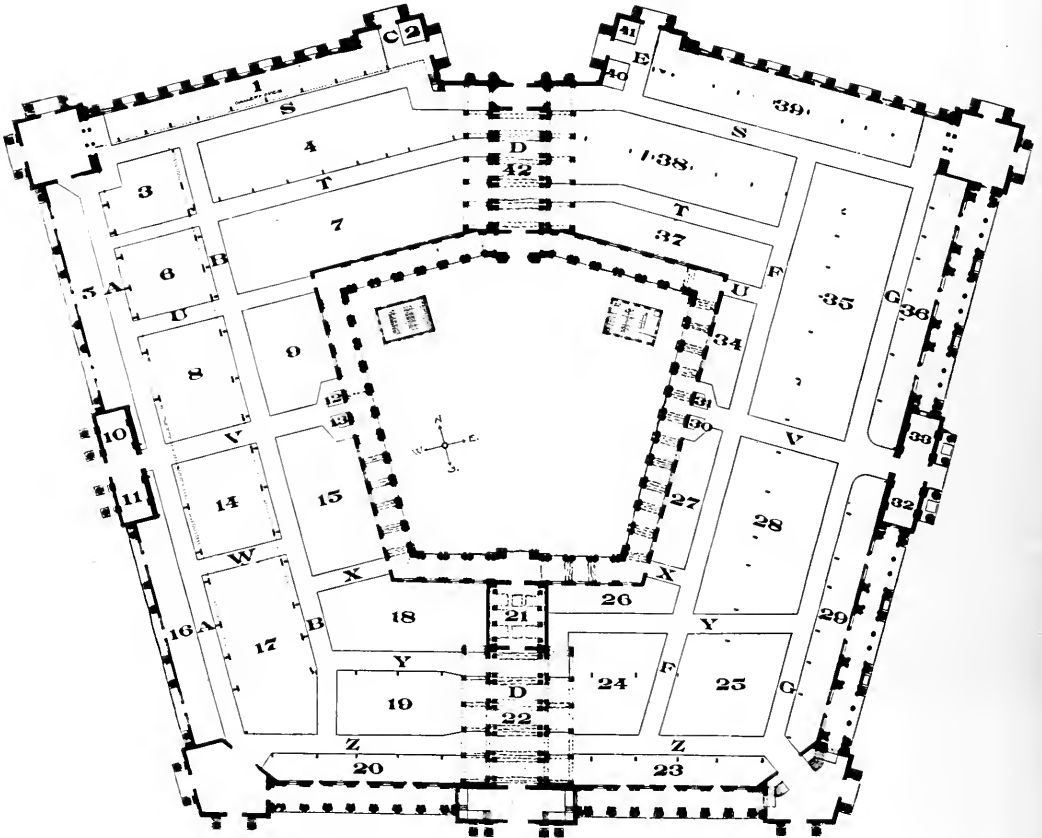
PLAN OF ELECTRICITY BUILDING.
